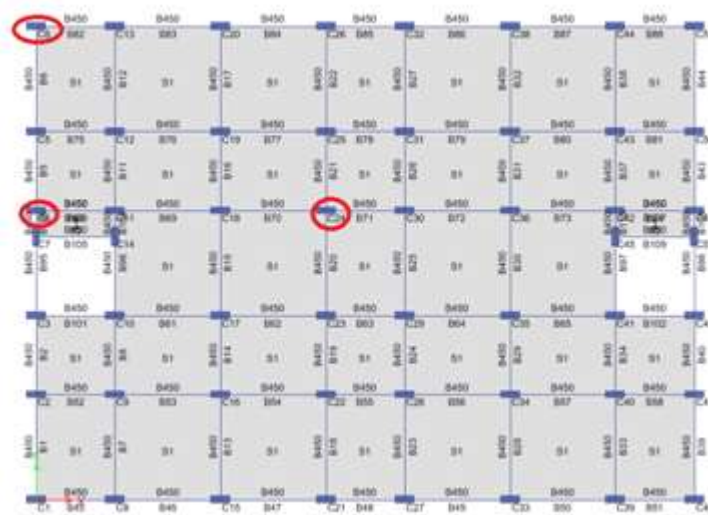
Structural plan with (A5) and without (B5) staircase at mid end location
